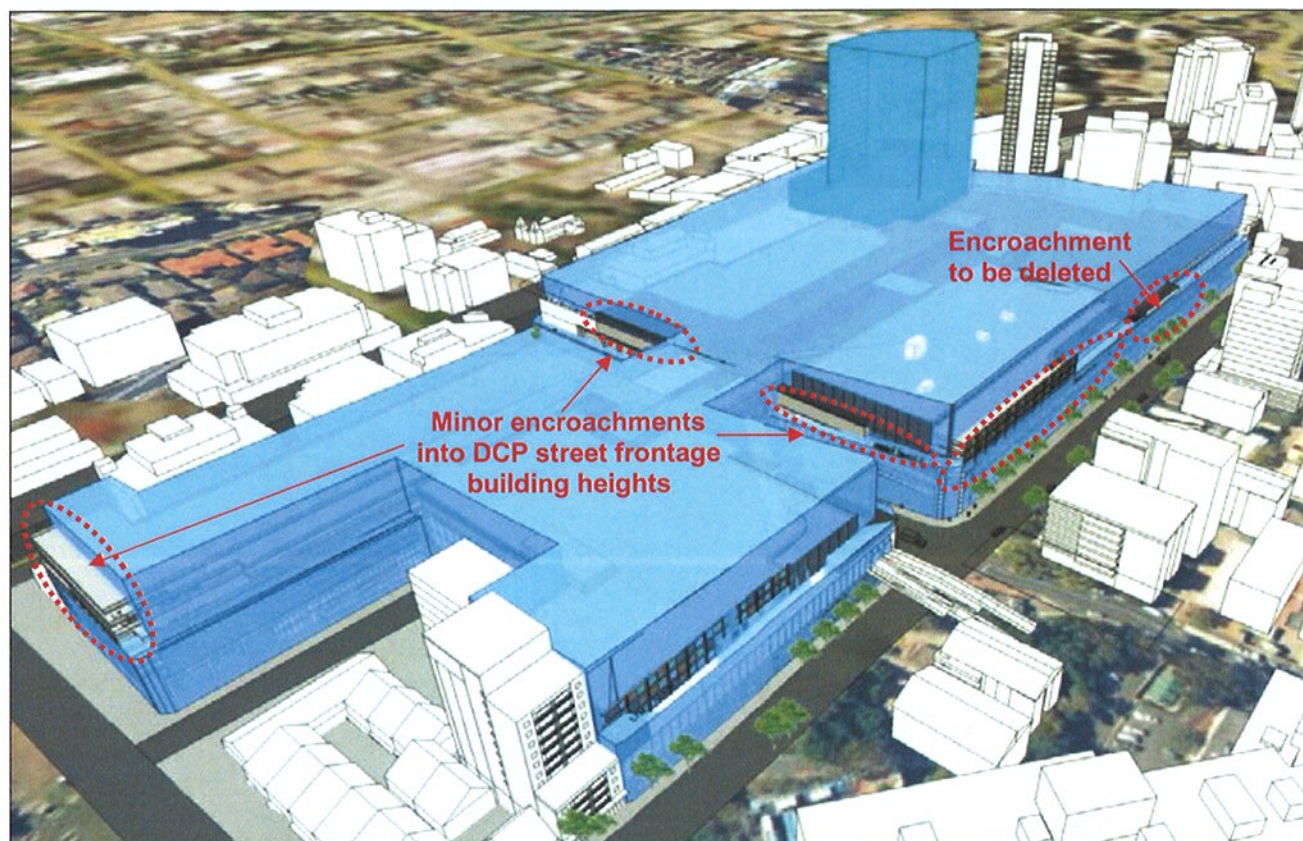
Proposed building envelope showing encroachment of DCP street frontage building height controls (Source: Proponent's Environmental Assessment)
